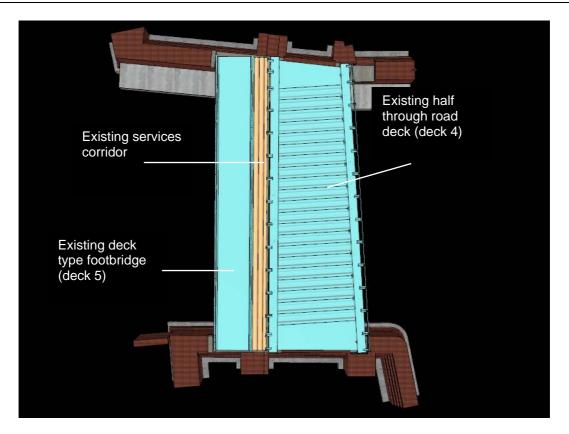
Sheepwash Bridge, plan on existing decks 4 and 5
